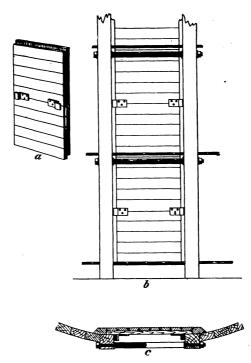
A continuous door: a, a section of the door; b, door frame with doors in position; c, cross section showing door and frame.
